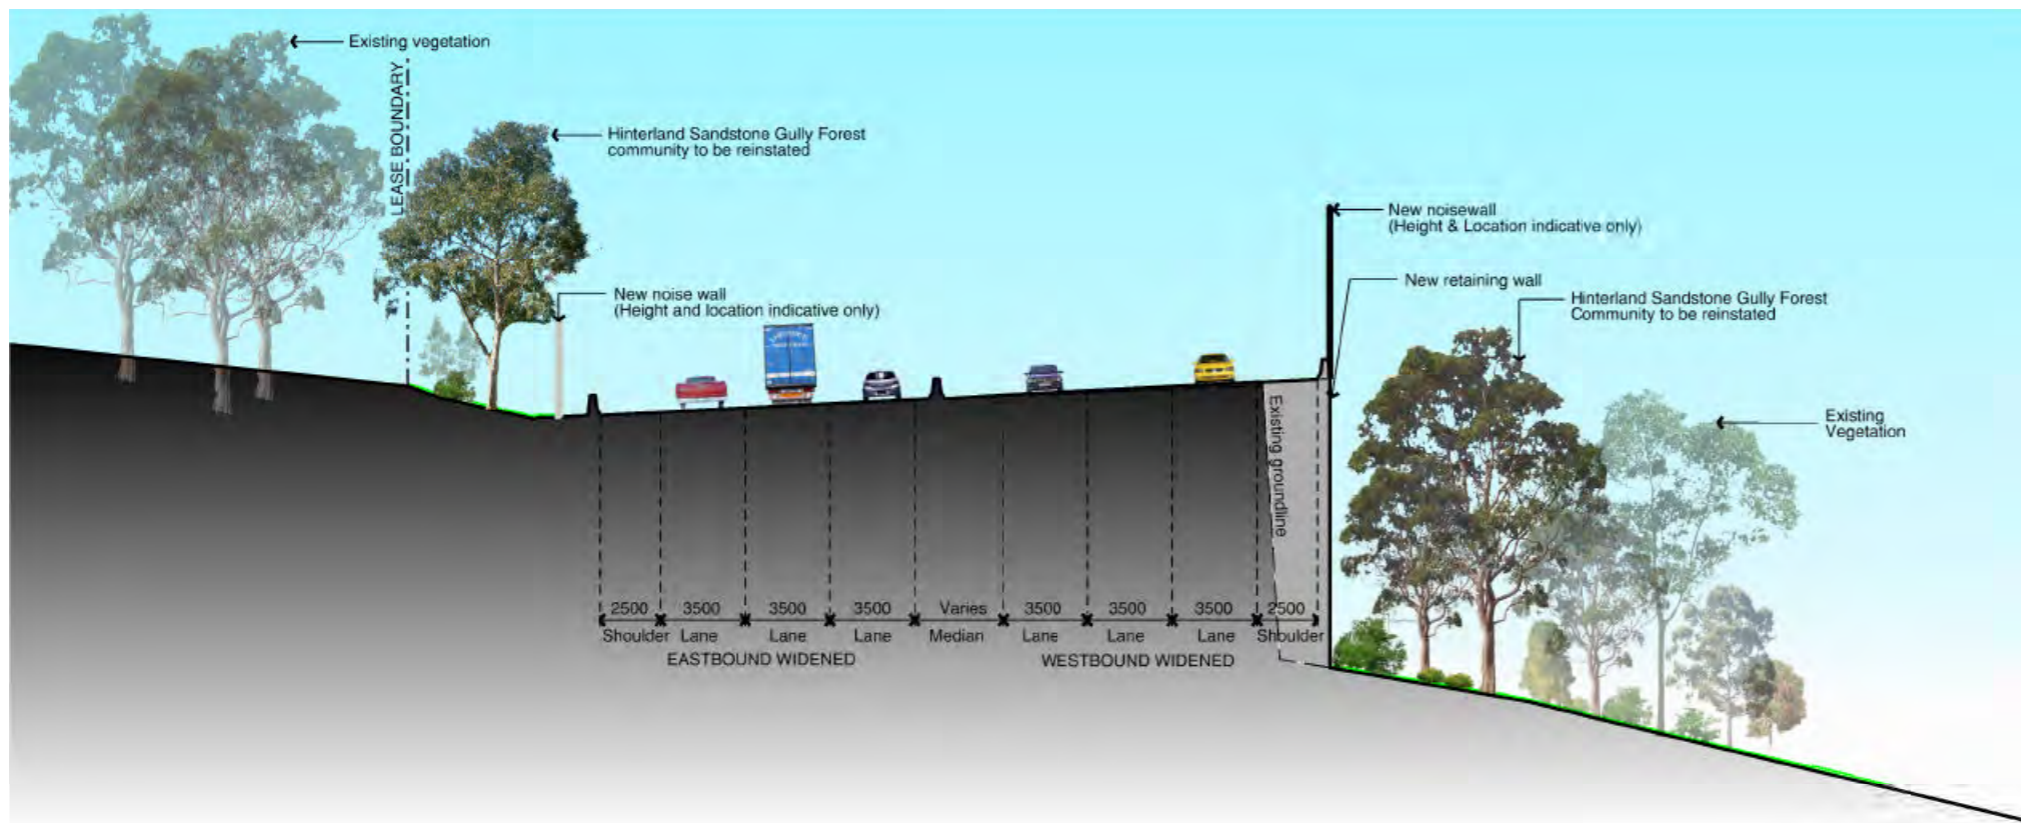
Stn 13600 Somerset Street east - Proposed
